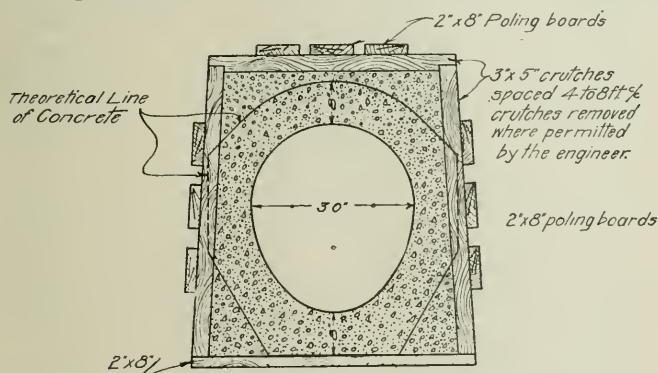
North Shore Sewer. Timbering Method on 30 in., 33 in. and 36 in. Sewer in Tunnel on Skokie Line—Contract No. 3.
